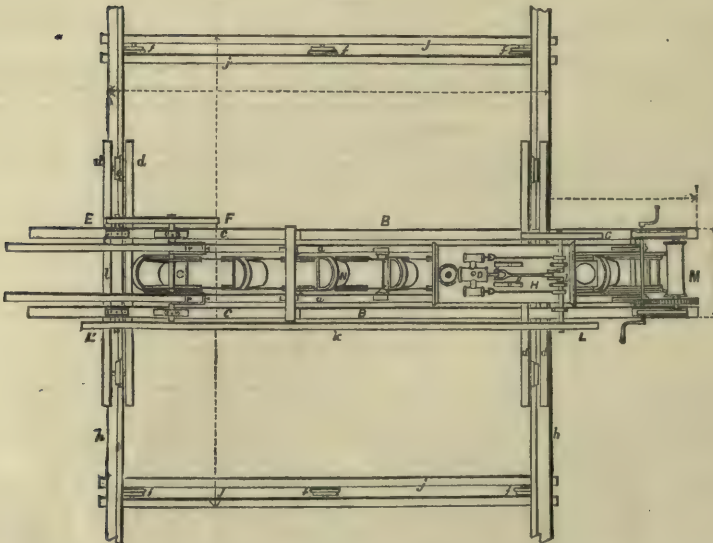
is a longitudinal section of this movable carriage-dredge when mounted and in working order; Fig. 2567 a plan; and Fig. 2568 a view of the end upon which the steam engine is placed. This dredging machine consists of a chain with buckets *a*, of which the axis of rotation *C* is mounted upon two parallel trestles *c*, fastened together upon two strong sleepers *B*, connected at each end by a series of transverse beams *d*, which constitute the rolling platform of the machine.
